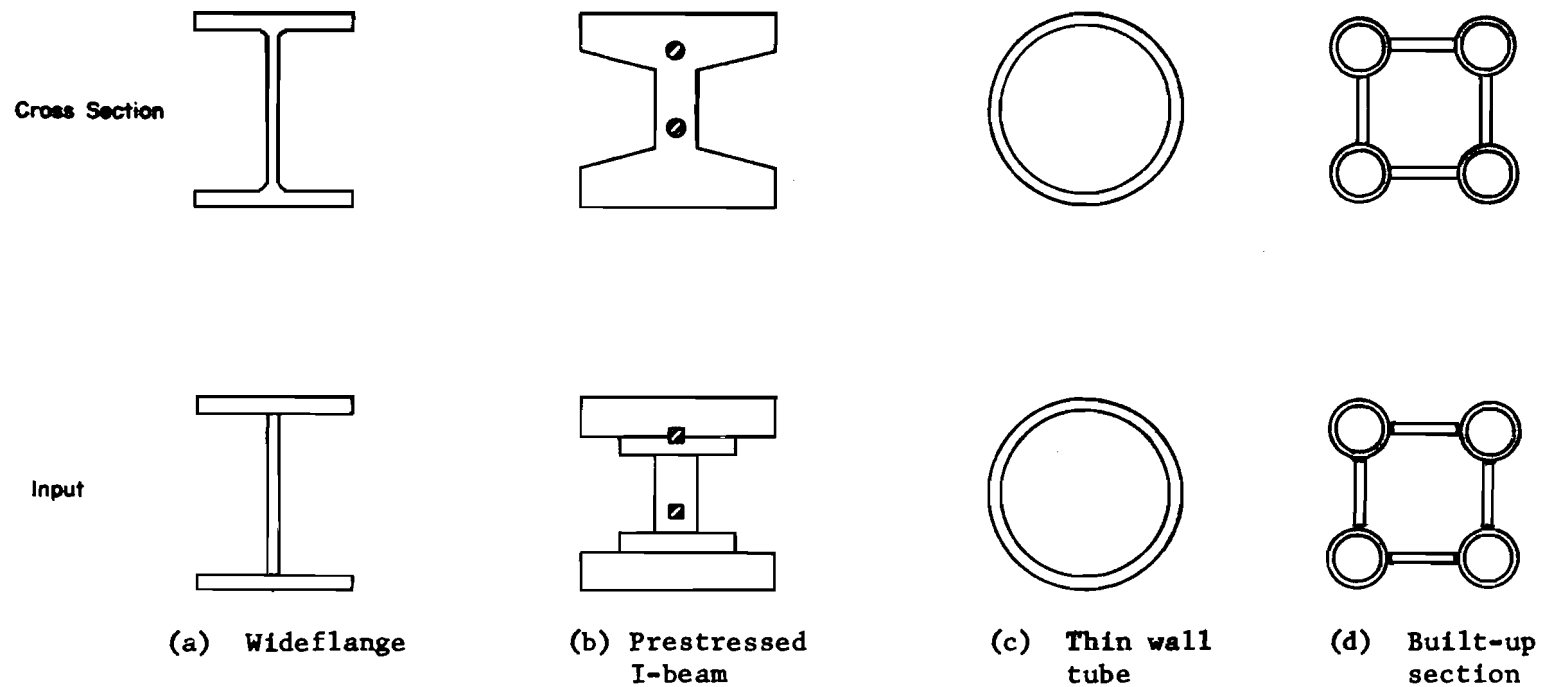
Representation of cross sections with rectangles and thin wall tubes.
